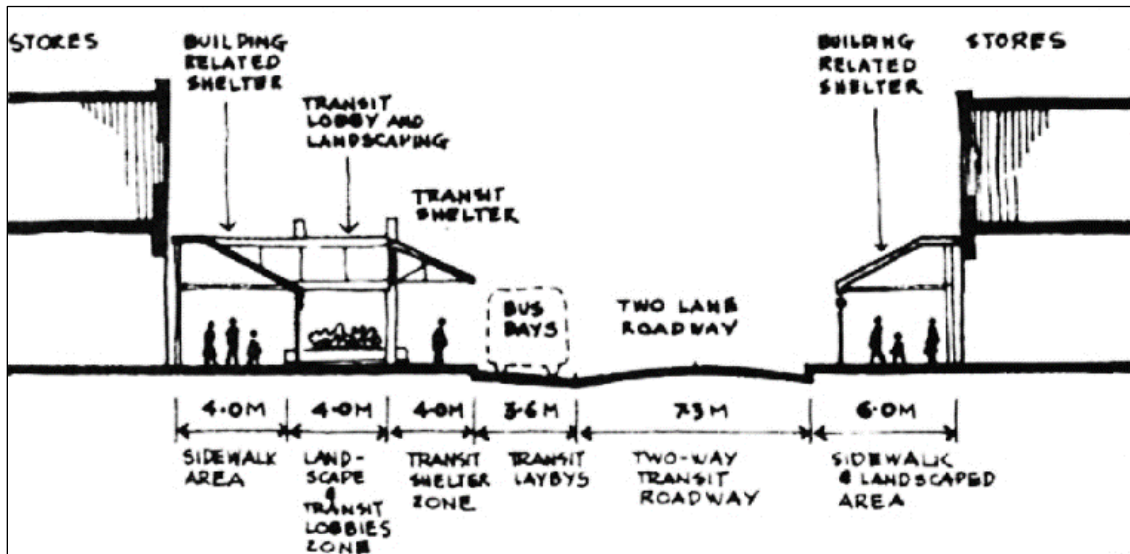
"As Built" cross-section of the Rideau sidewalk enclosures (Chen 1986)
